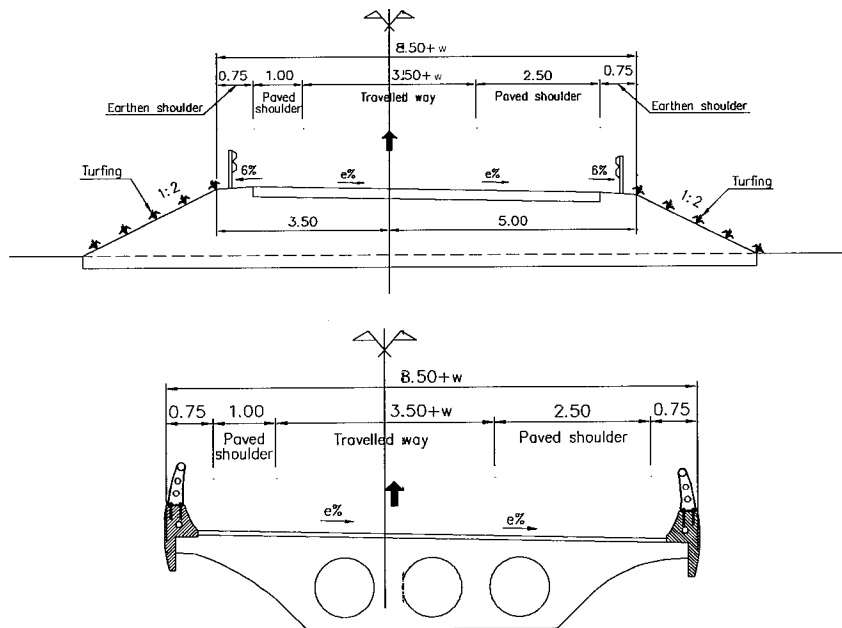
Typical Cross Sections of Interchange Ramp Way (1 Direction 1 Lane)
